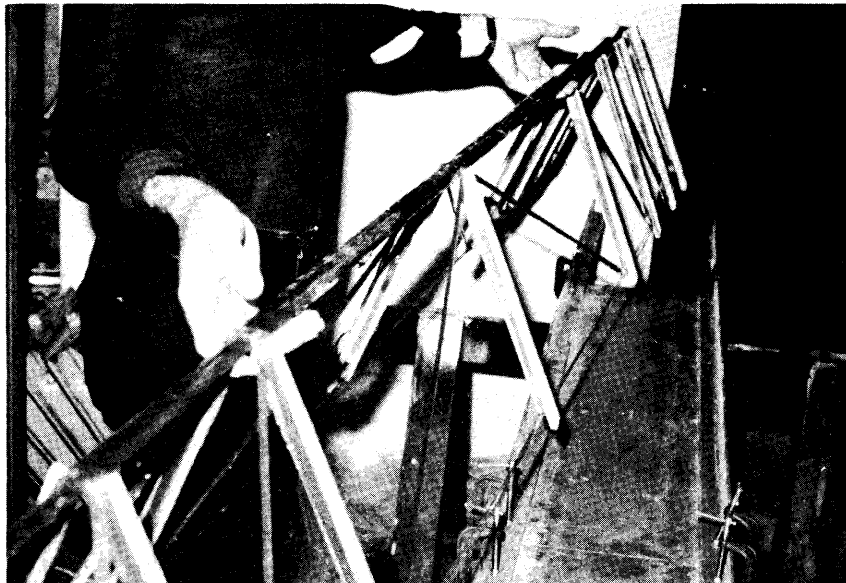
Completed web and chord elements of TTG-3 prior to attaching to the top plate assembly.
